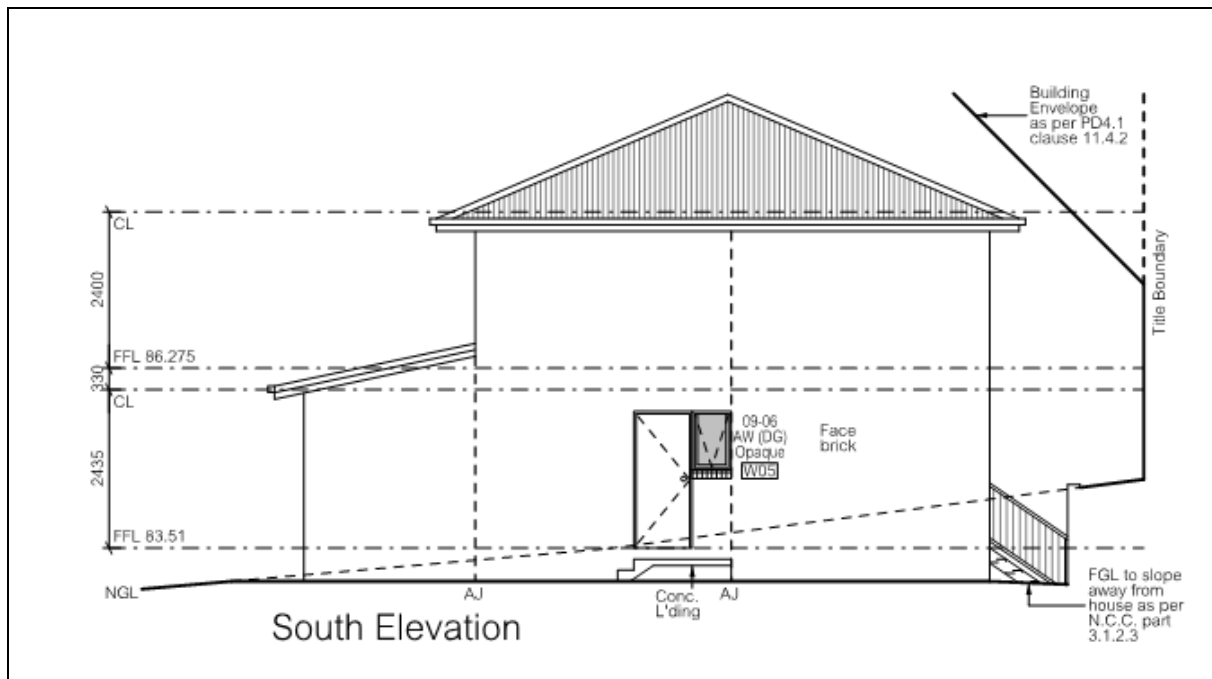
Proposed south elevation, facing 83 Augusta Road.
